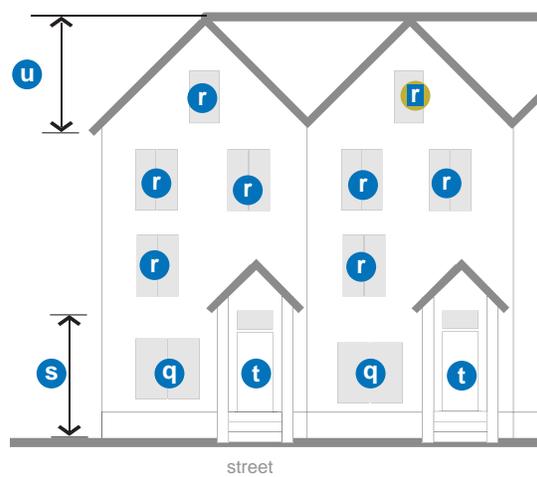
(3) Townhome Building: Street Facade Requirements
